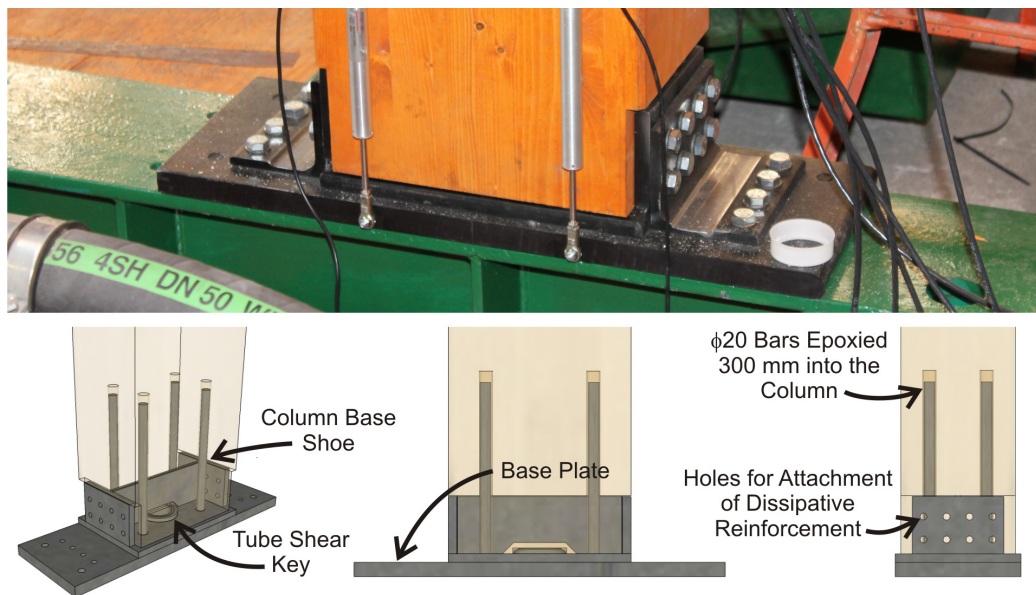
Column-foundation connection used in 2/3rd scale, 3-storey dynamic test frame
